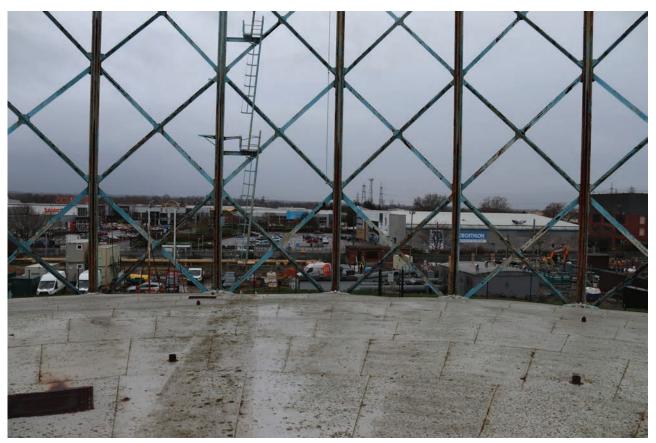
General view of the retail park to the south-west of the site, from the north-east
